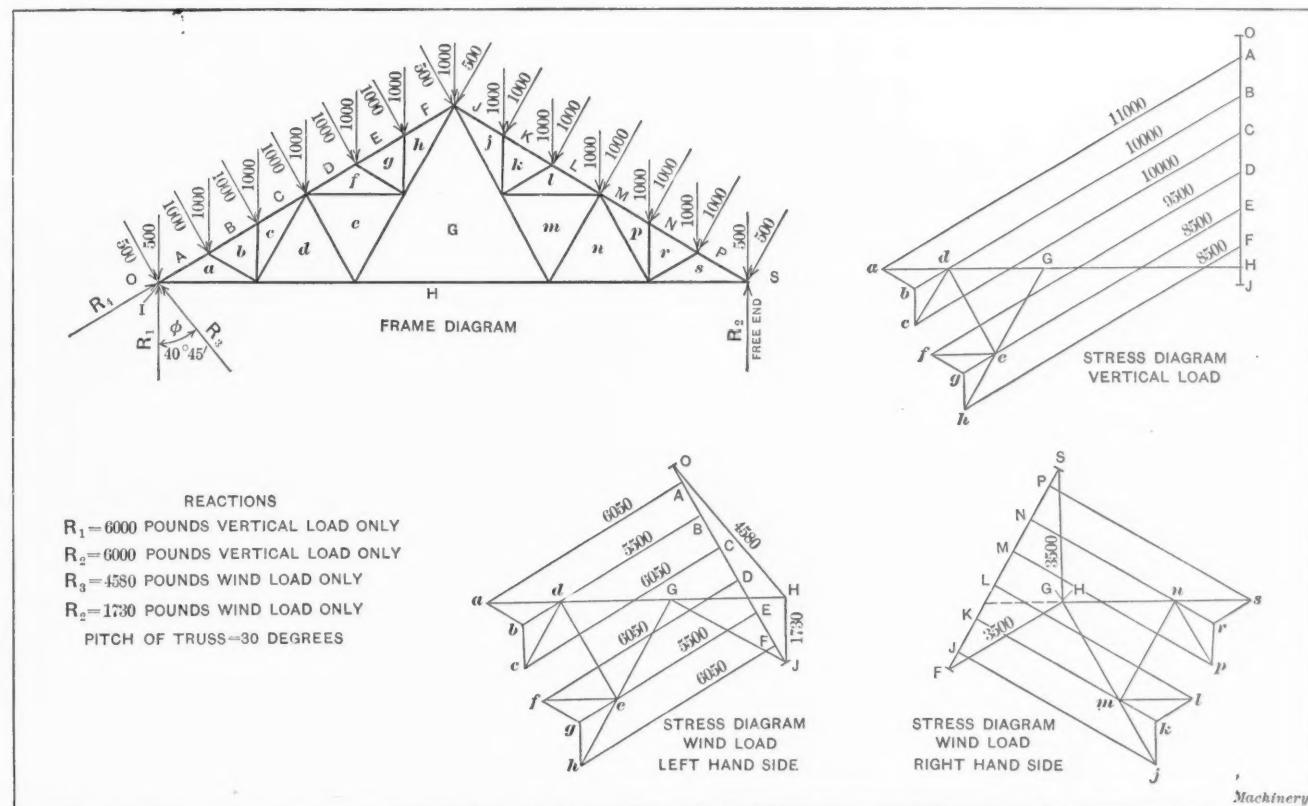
Frame and Stress Diagrams for Twelve-panel Fan Roof Truss
